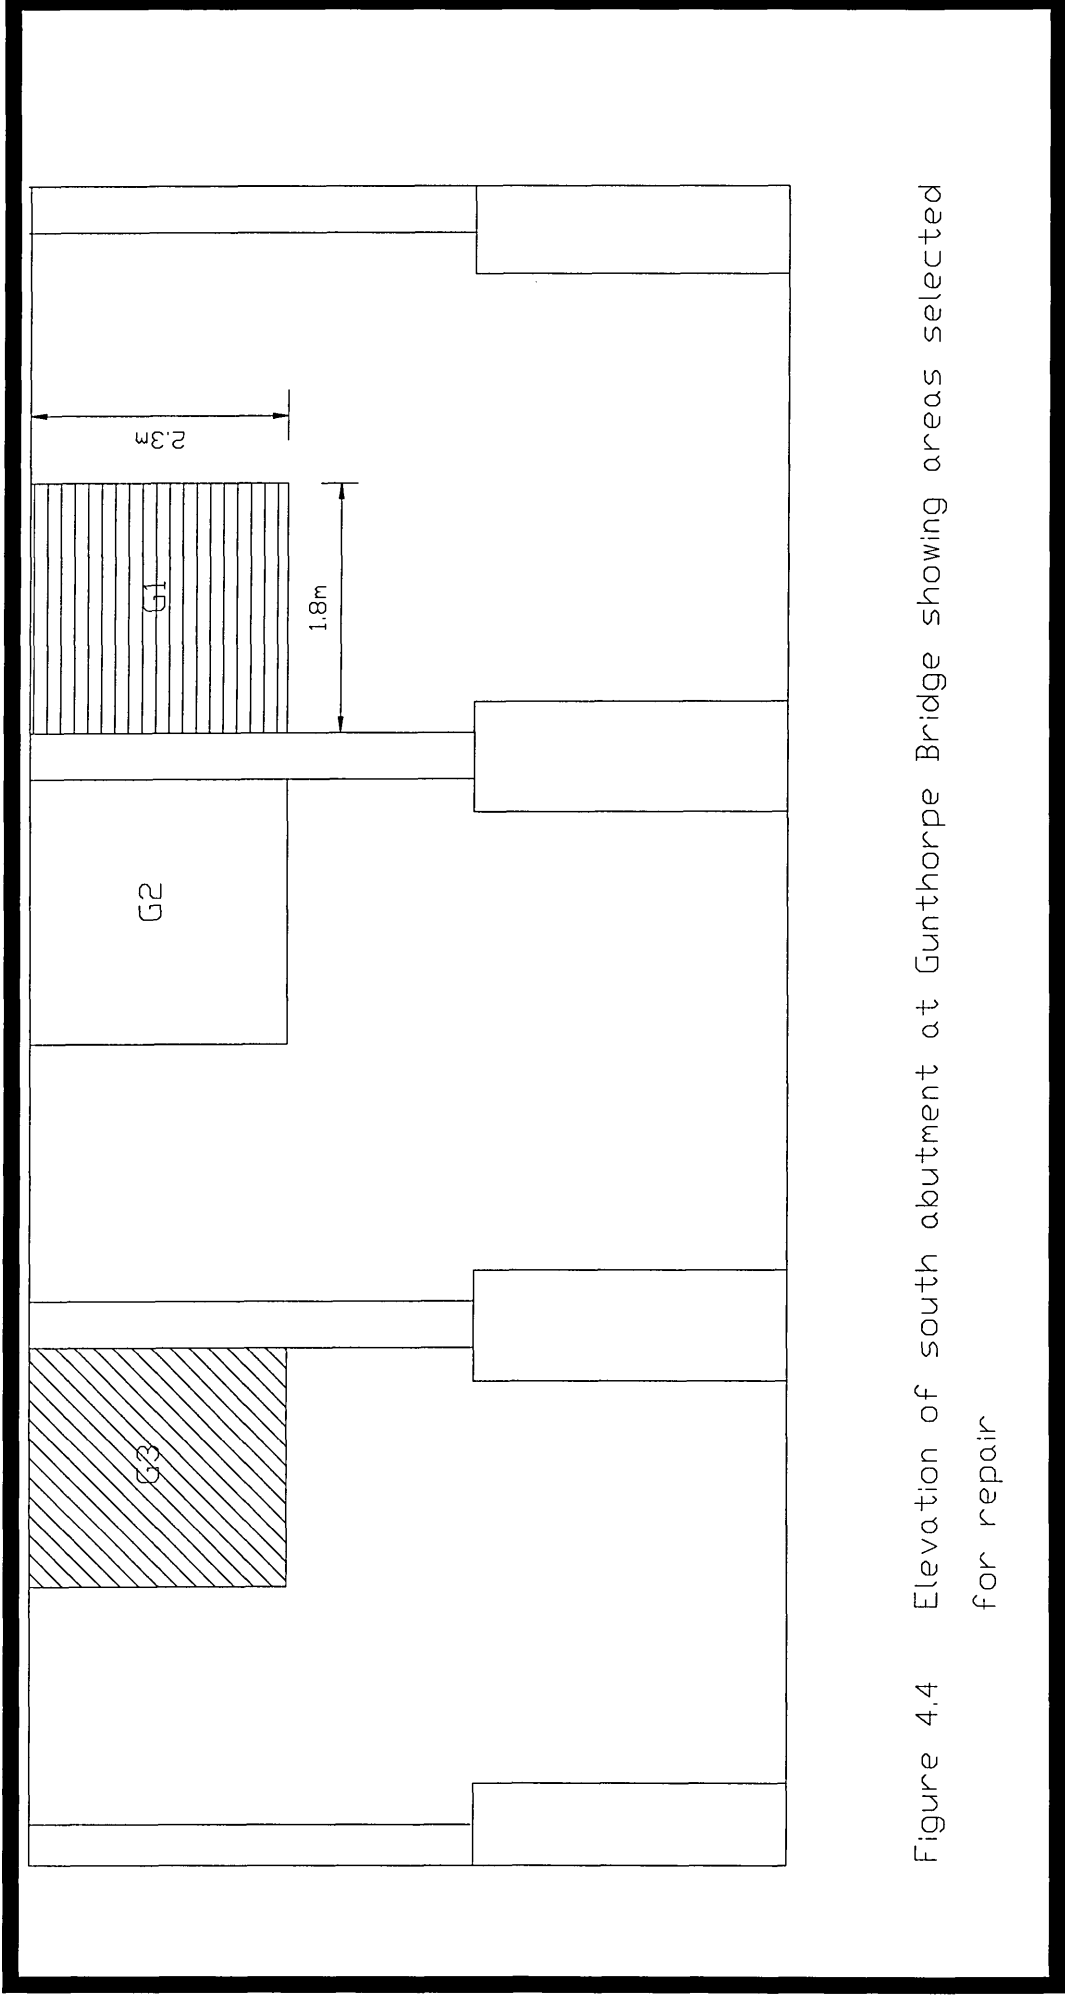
Elevation of south abutment at Gunthorpe Bridge showing areas selected for repair
